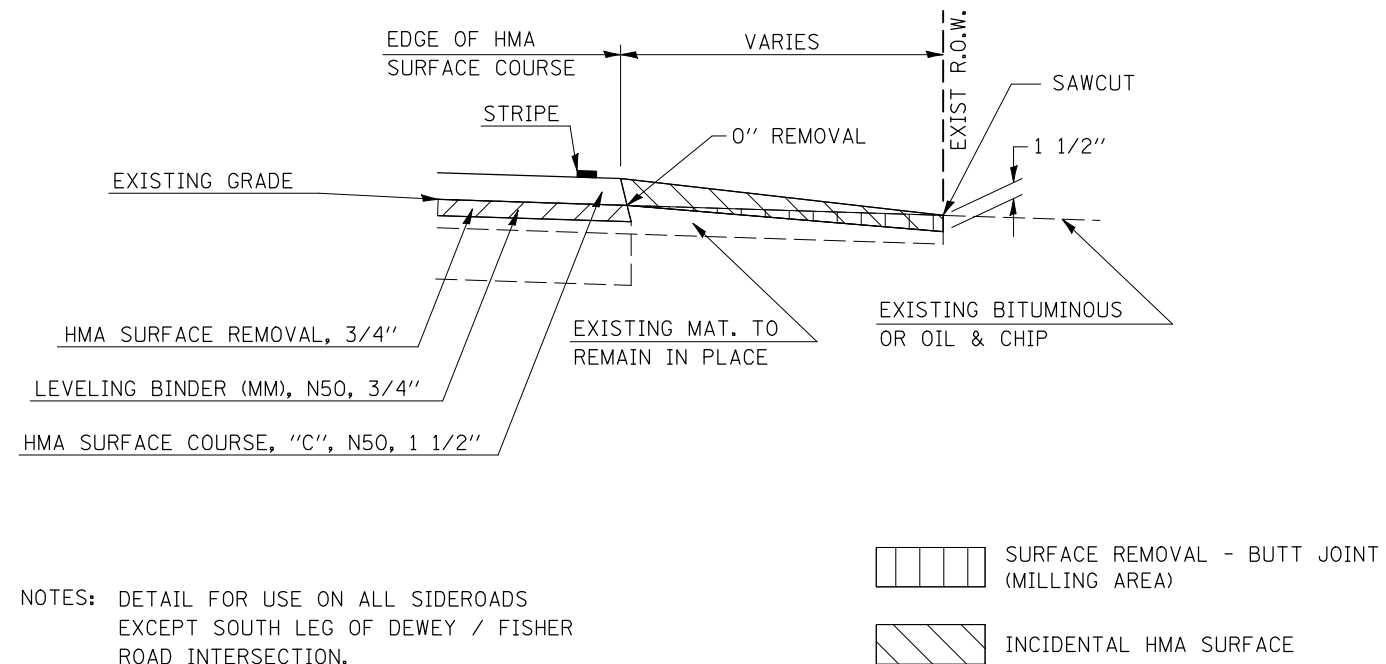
DETAIL FOR MILLING AND RESURFACING @ DEWEY / FISHER ROAD STA. 1925+69 RT.
